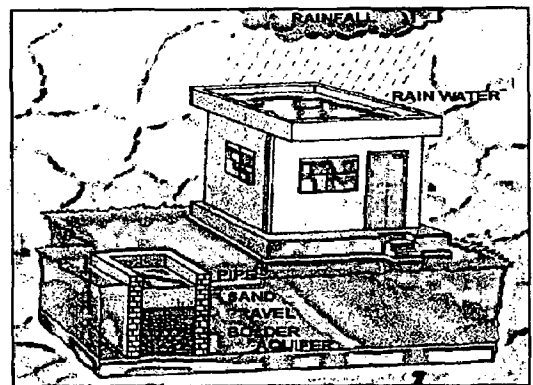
Elements of roof top rainwater harvesting system.
